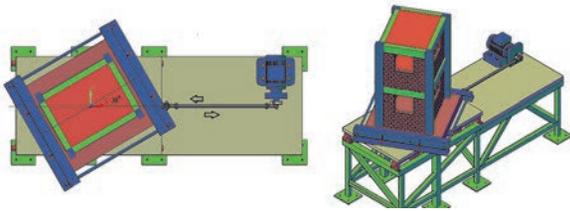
3D and plan view of Specimen 2 (angle: 30°)
